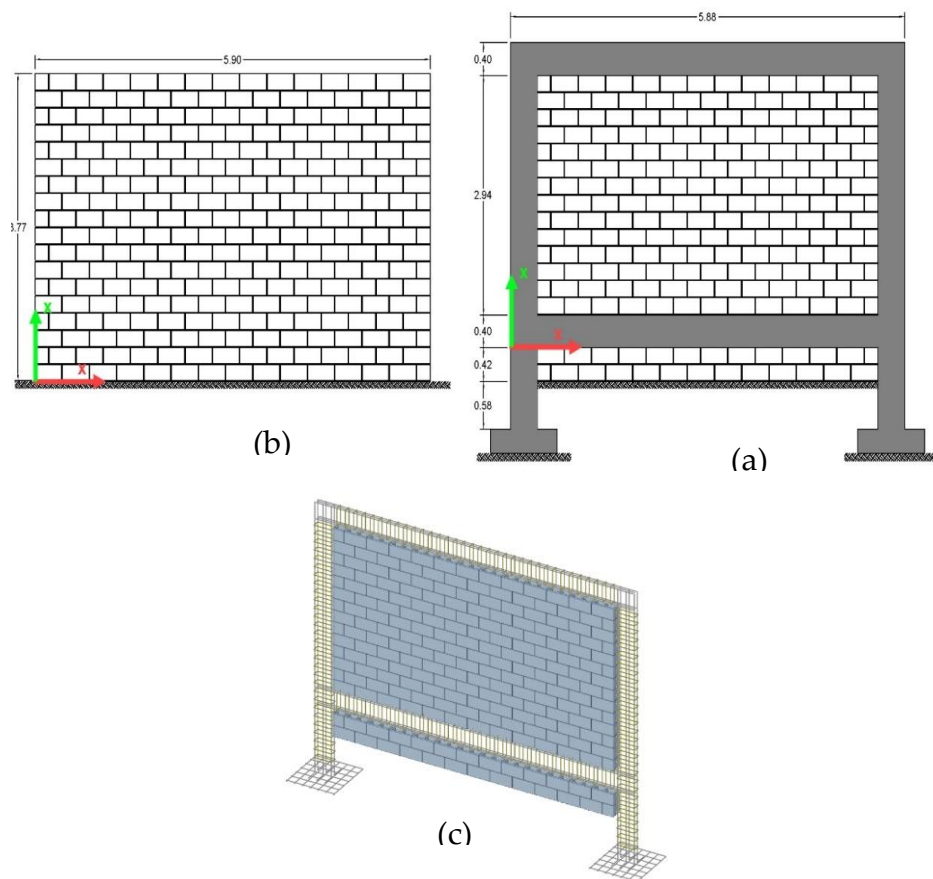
FEA modeling, (a) mixed system, (b) load-bearing wall system, (c) reinforcing of frame
